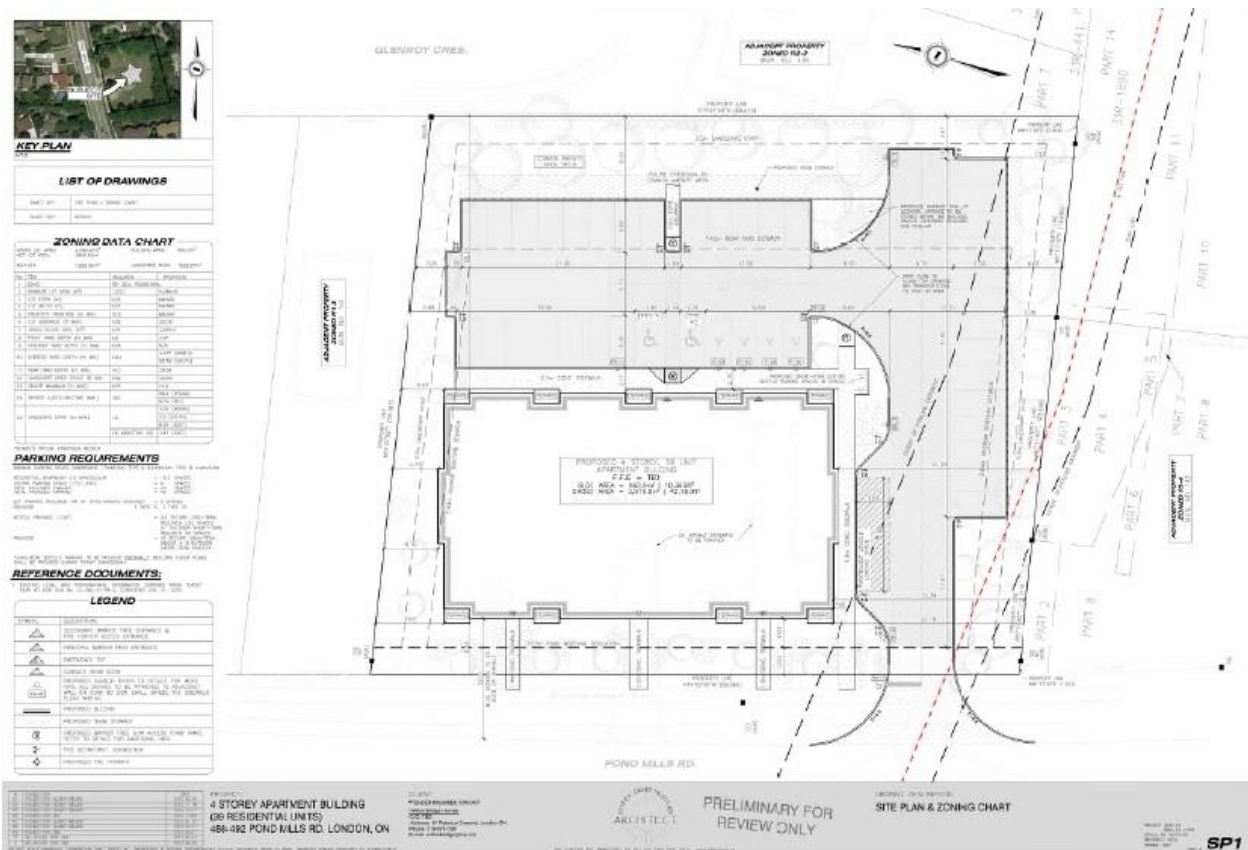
Conceptual Site Plan Denoting the location of the gas pipeline in red.
